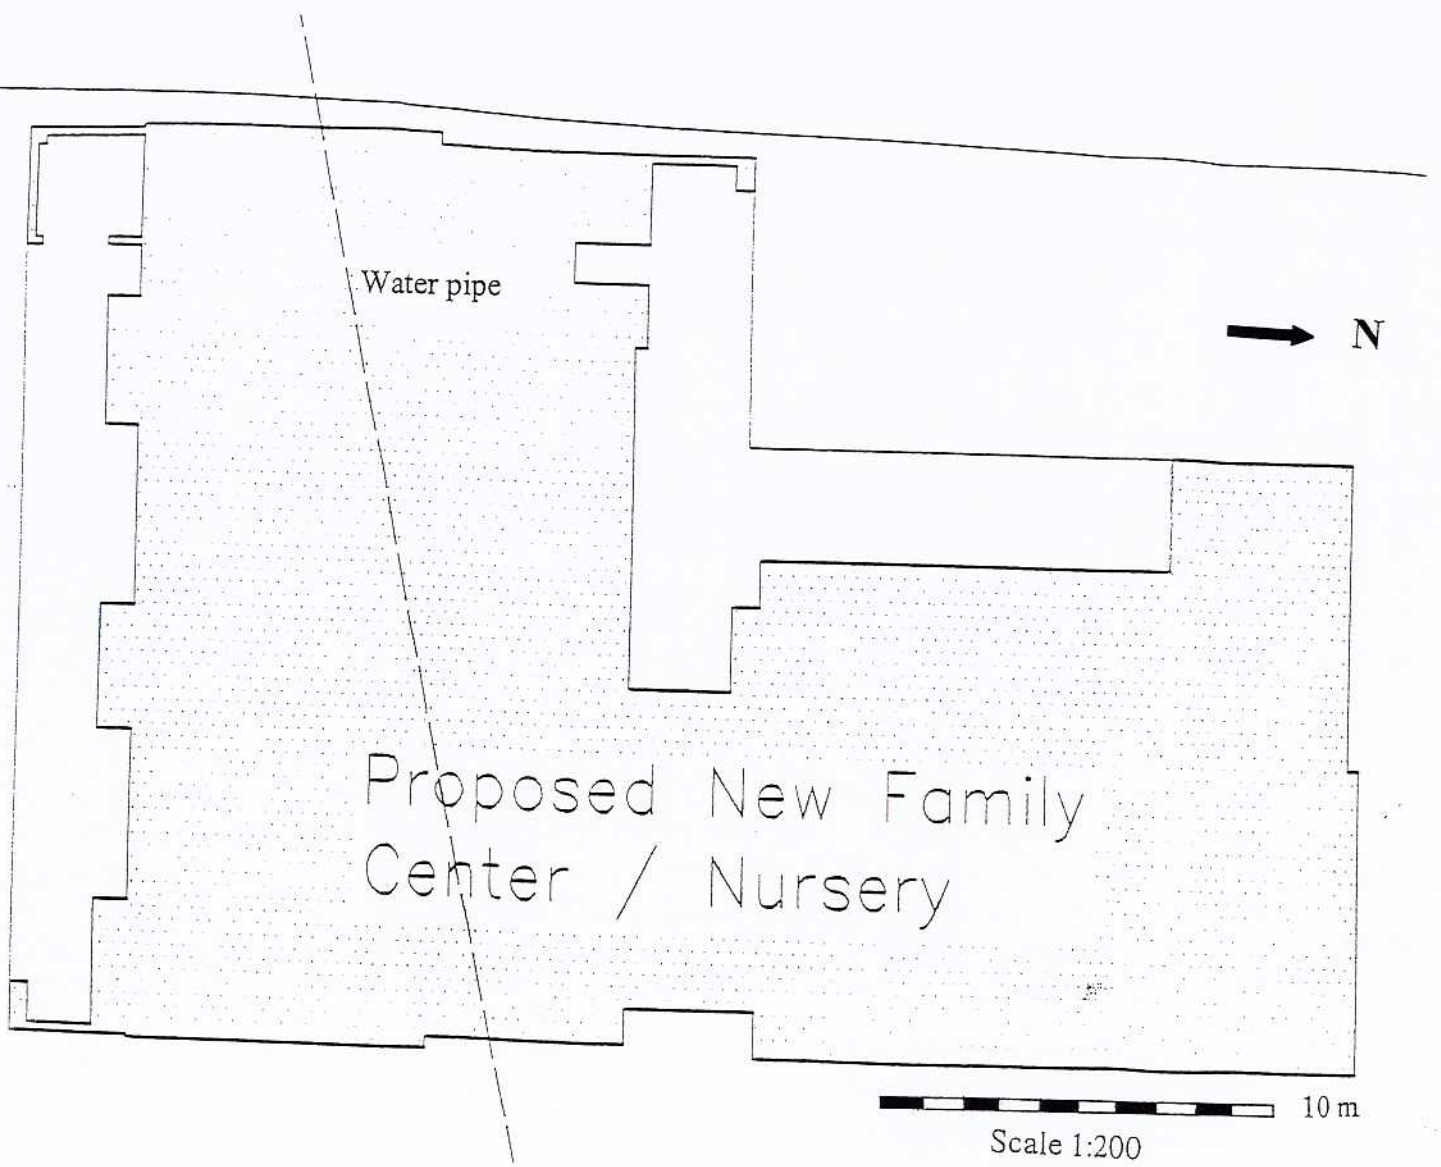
Plan of foundation (Scale 1:200) Leominster Nursery and Family Centre
